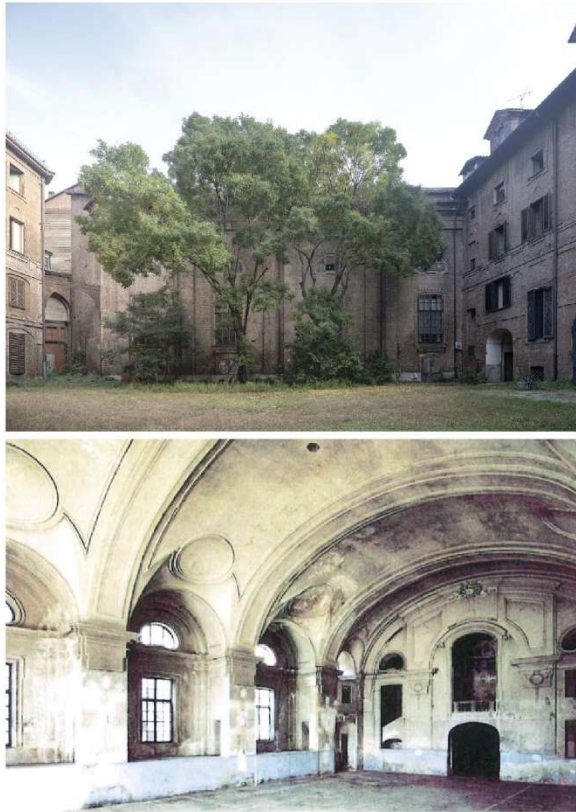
Photos of the Maneggio Alfieriano: southwest façade above and main space below.
